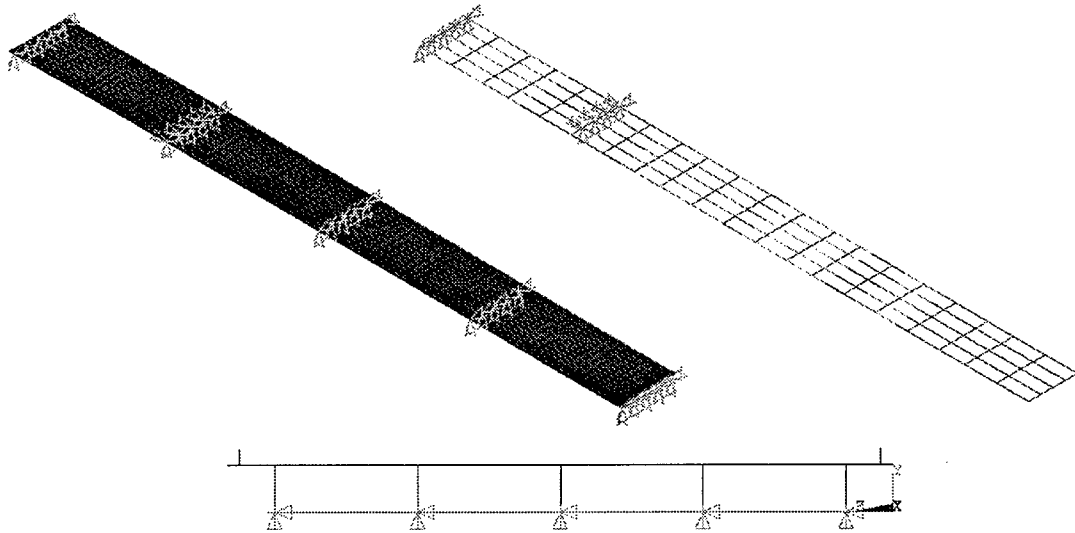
Model of Dan River Bridge with Framing Plan and X-Sectional View
